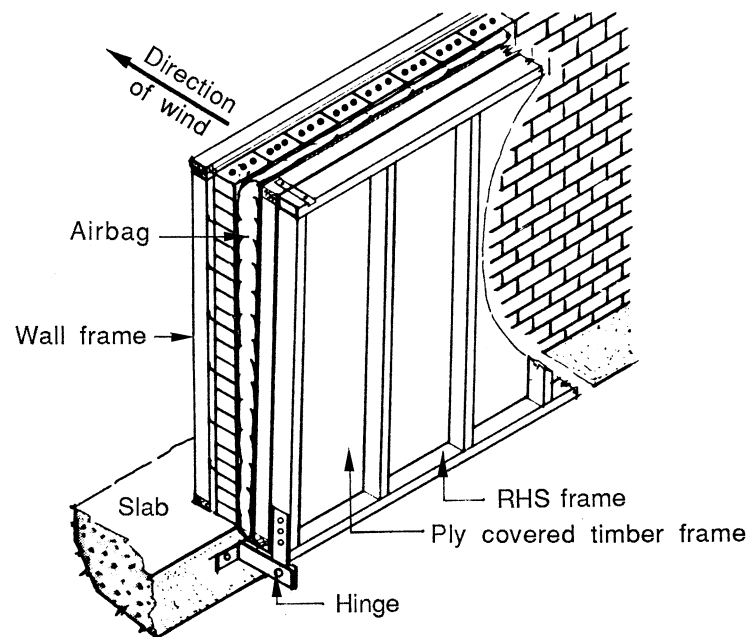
Loading Frame for Applying Positive Pressure to Brickwork
